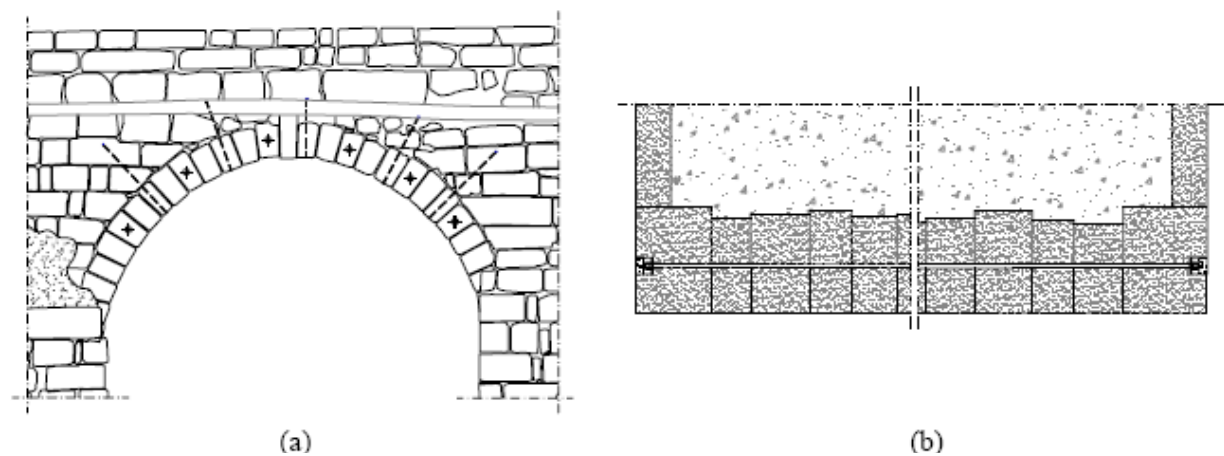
Strengthening system using anchors and radial pinning; (a) anchor scheme; (b) cross section showing horizontal anchor (Oliveira, 2006).
